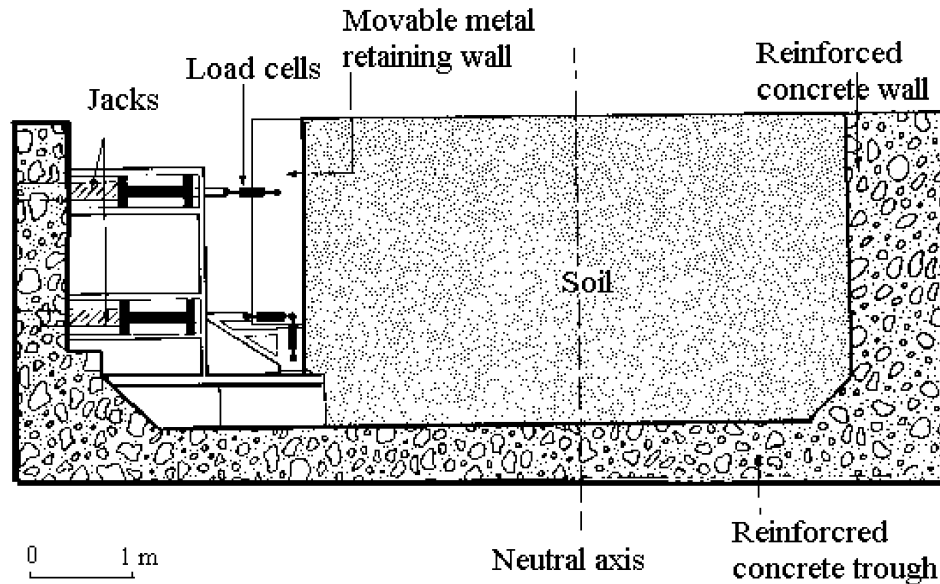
Experimental Retaining Wall at TRRL, England
